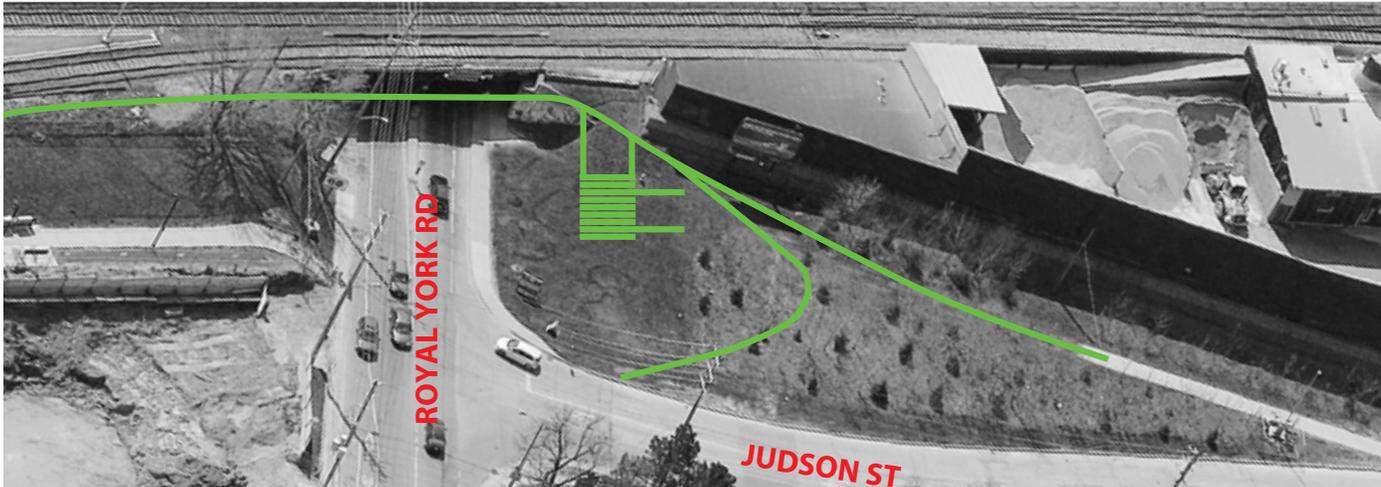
Conceptual diagram in plan and elevation of the Royal York Road Overpass.
